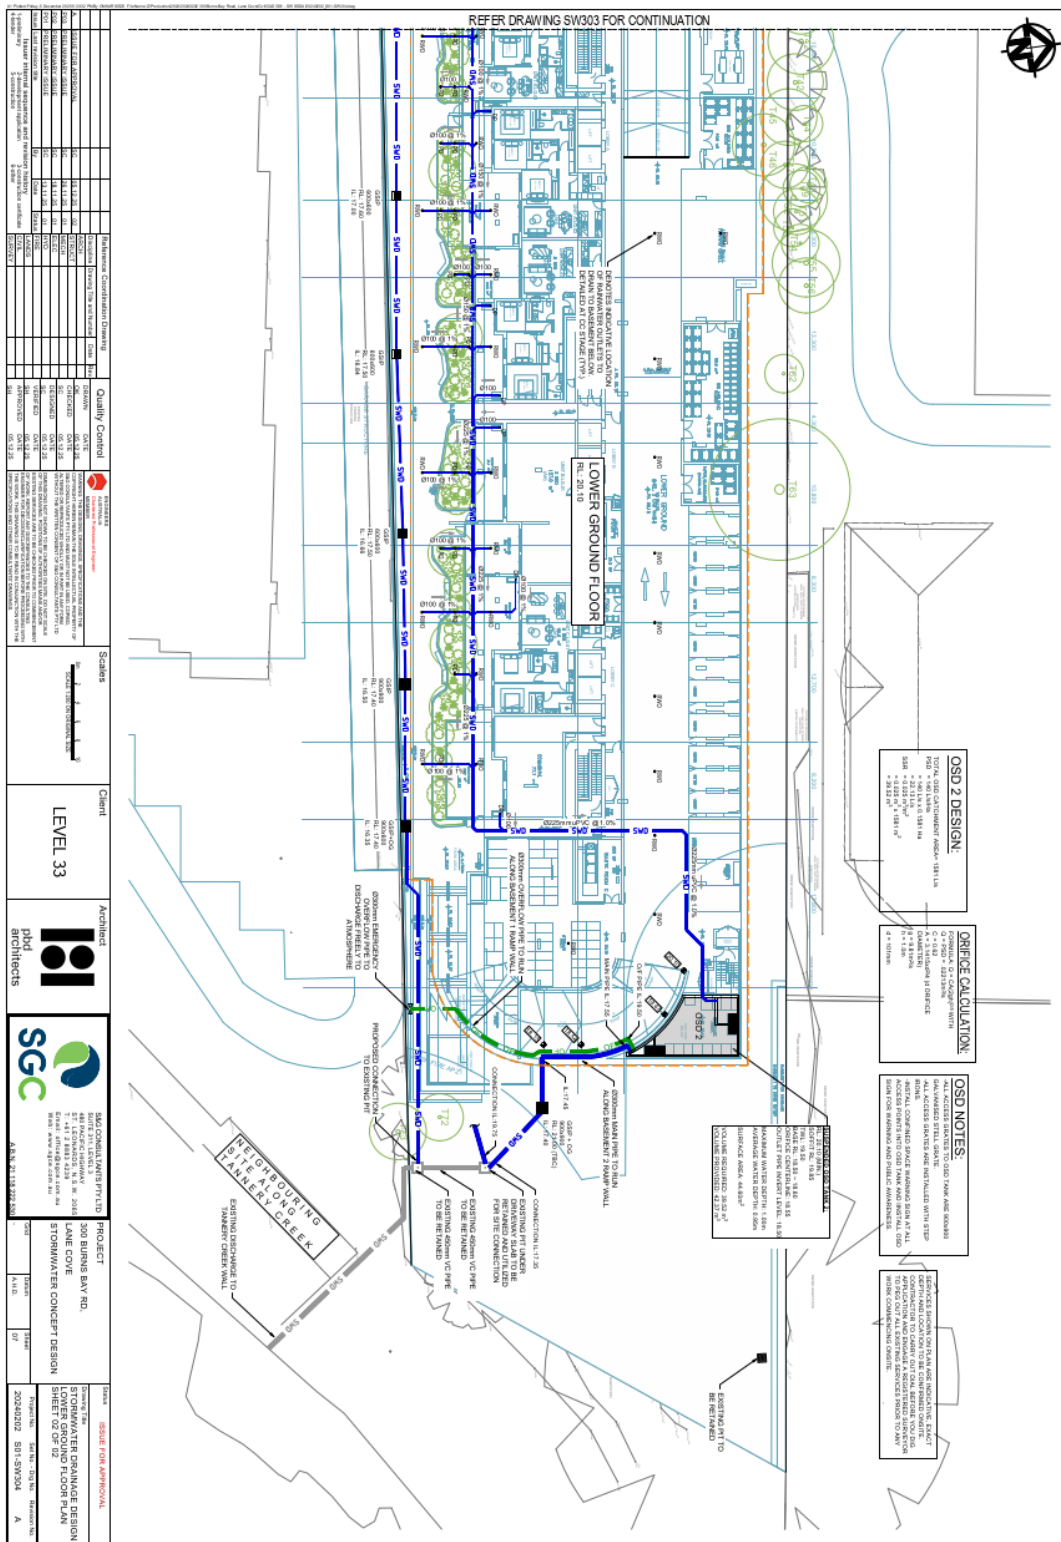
Stormwater Plan – Lower Ground Floor – Sheet 2
